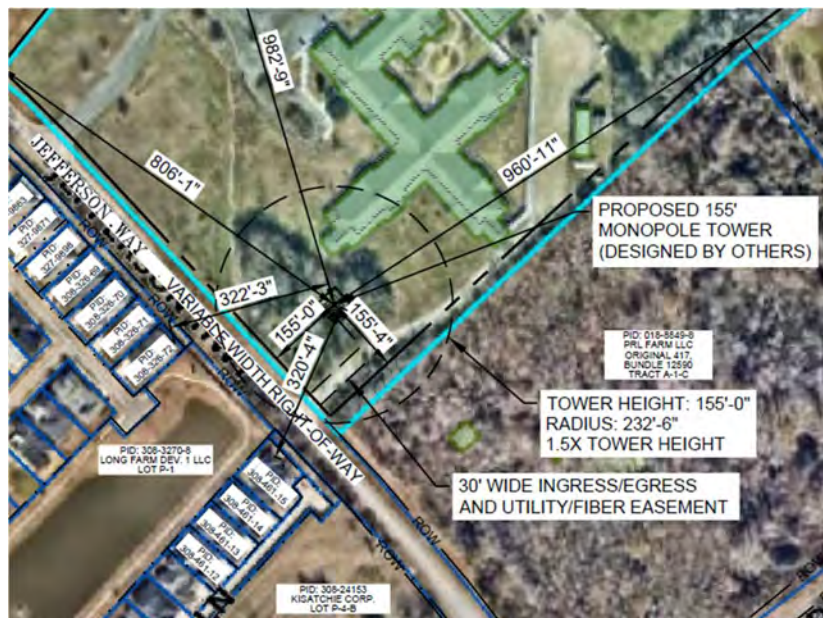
Site Plan with the required and proposed setbacks (Sheet C-1.1)
